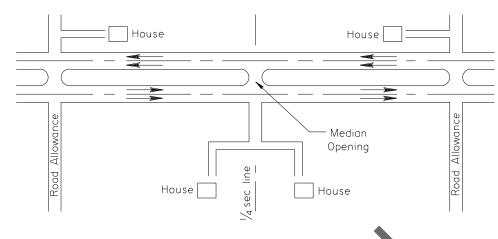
(Expressways) Joint Farmstead Access
